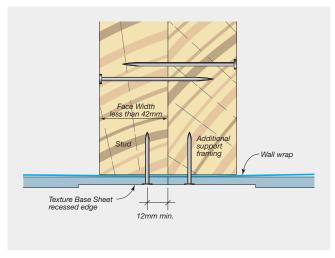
Vertical Sheet Joint with Additional Support Framing
